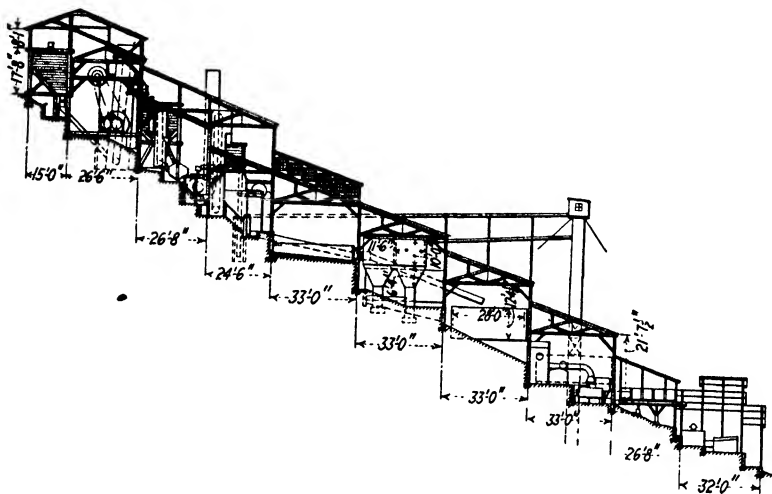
GENERAL CROSS SECTION OF MILLING PLANT.
